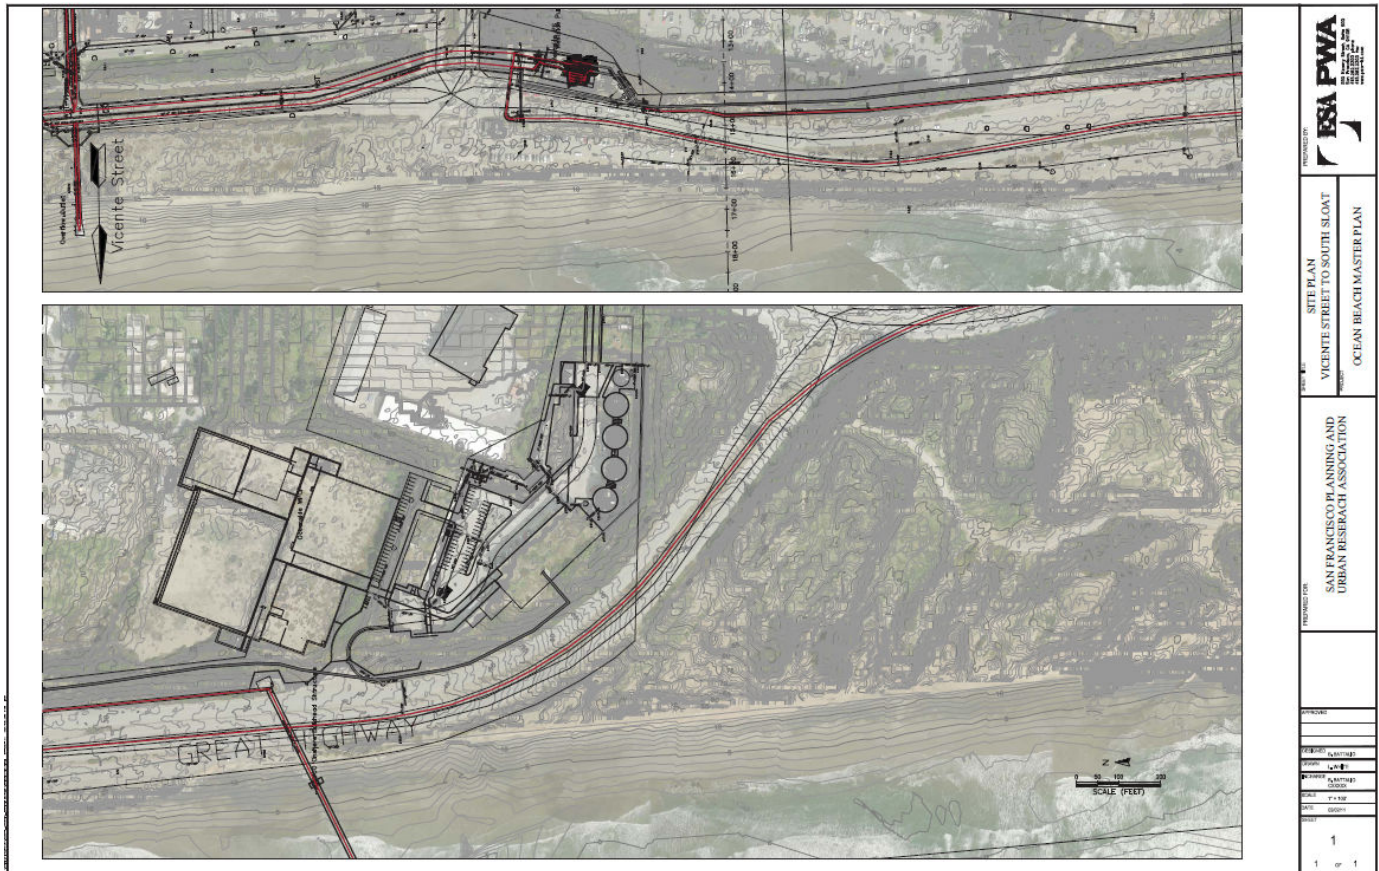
Plan extents of the proposed cobble berm are generally from Sloat Boulevard to the south end of the Southwest Sewer Treatment Plant, in the Master Plan region called South Ocean Beach (SOB).
